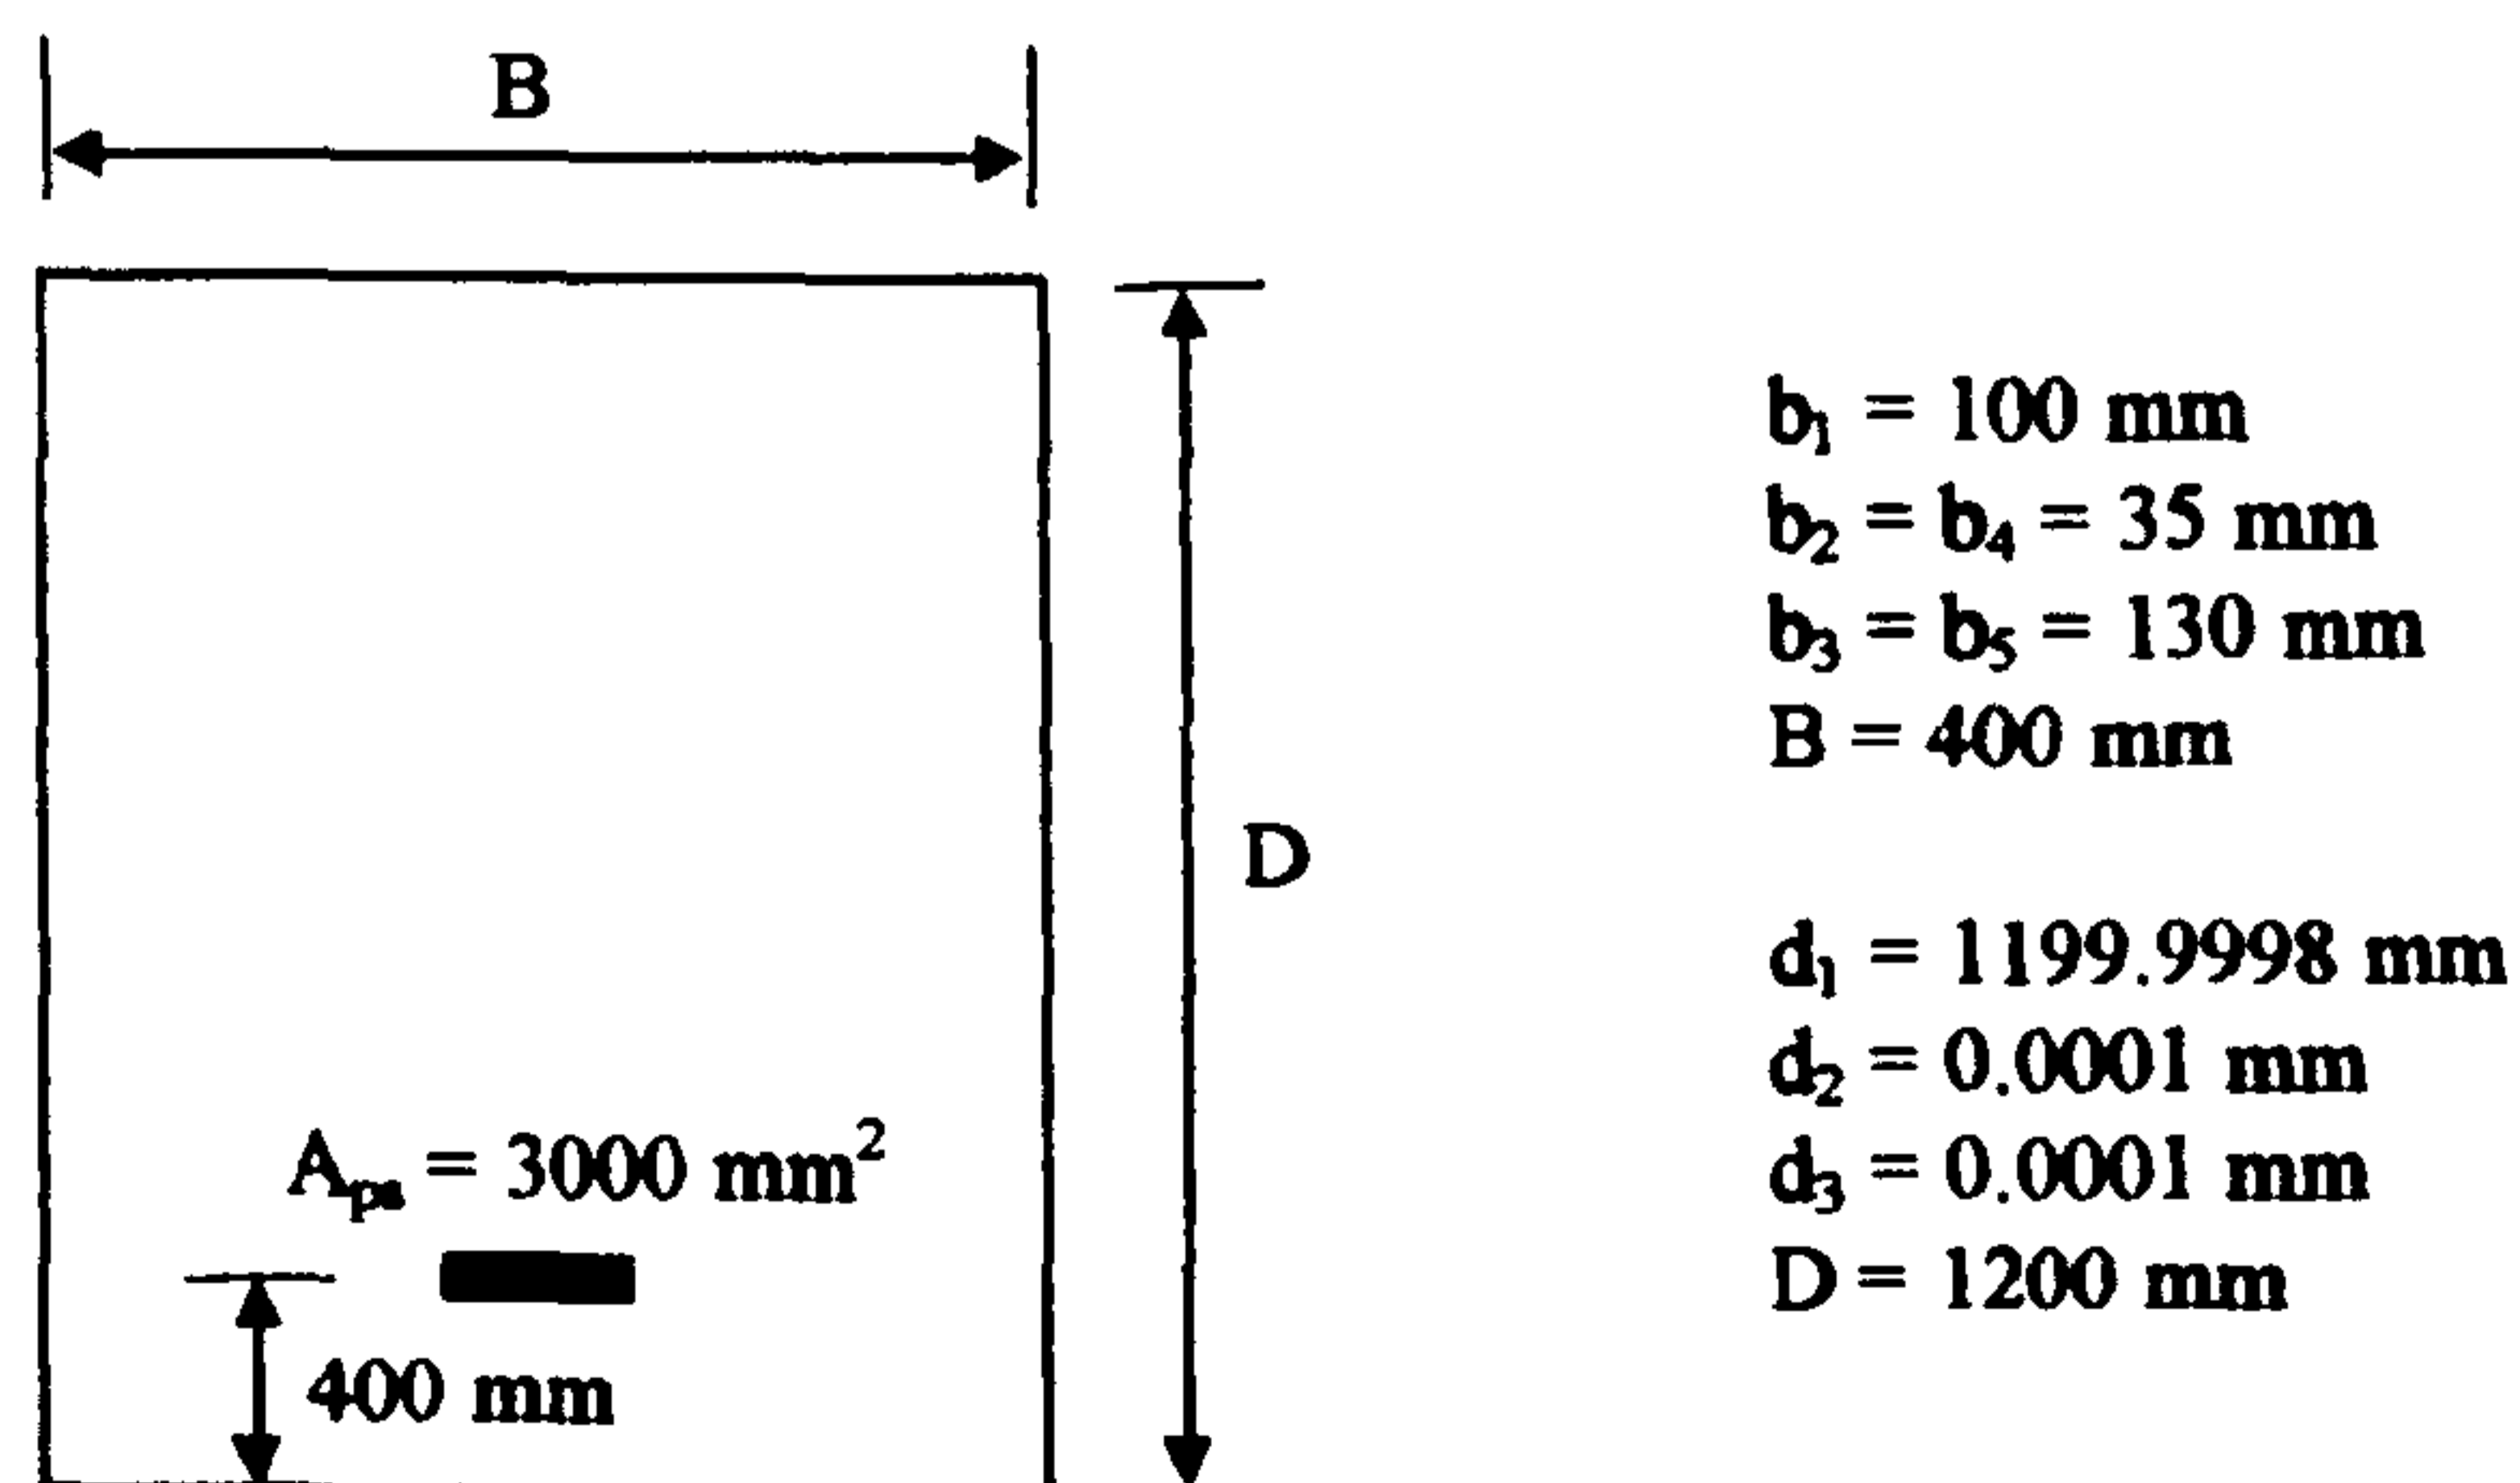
Rectangular cross-sectional properties for example 3; it is generated from a concrete trough shape.
